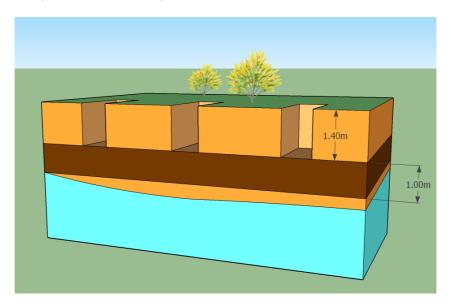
Illustrates the minimum acceptable 1m 'unstaurated zone' below the base of any grave excavation. In practice the unsaturated zone may be many metres in depth.
